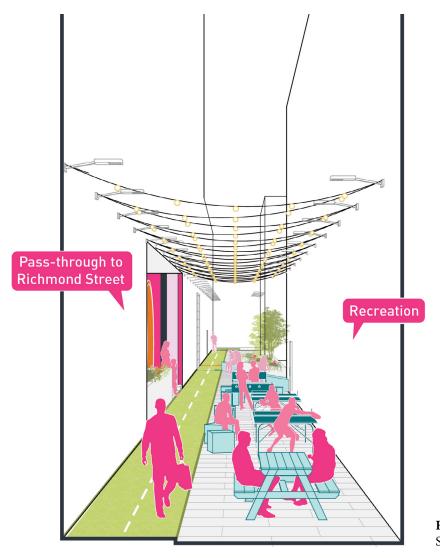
Laneway 4 Design; Section 4a, perspective section
